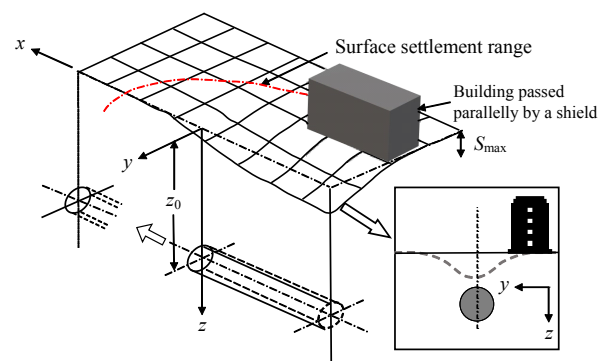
Ground spatial deformation induced by tunneling^[1]
